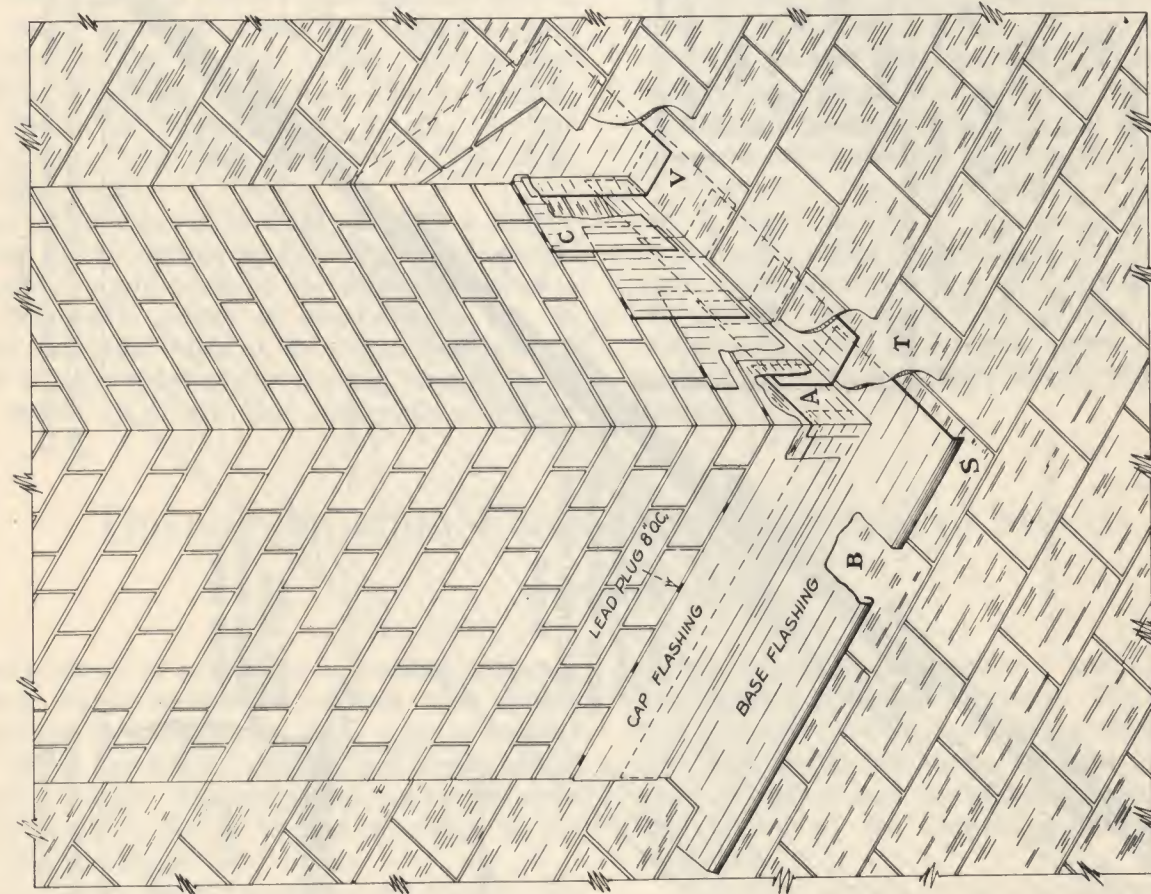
PERSPECTIVE VIEW SHOWING FLASHING AT FRONT AND SIDE OF CHIMNEY FOR SLATE, FLAT TILE AND SHINGLE ROOFS
